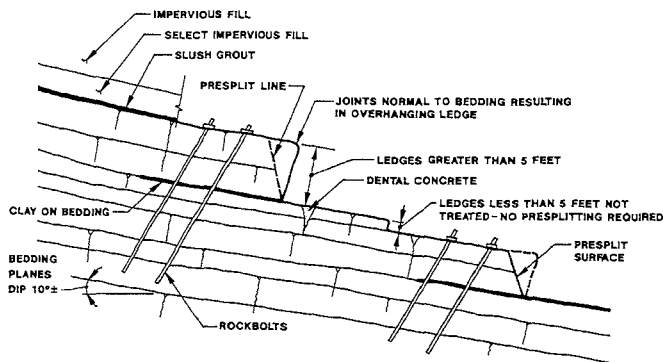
BATH COUNTY PUMPED STORAGE PROJECT, VIRGINIA--UPPER DAM LEFT ABUTMENT CORE FOUNDATION
